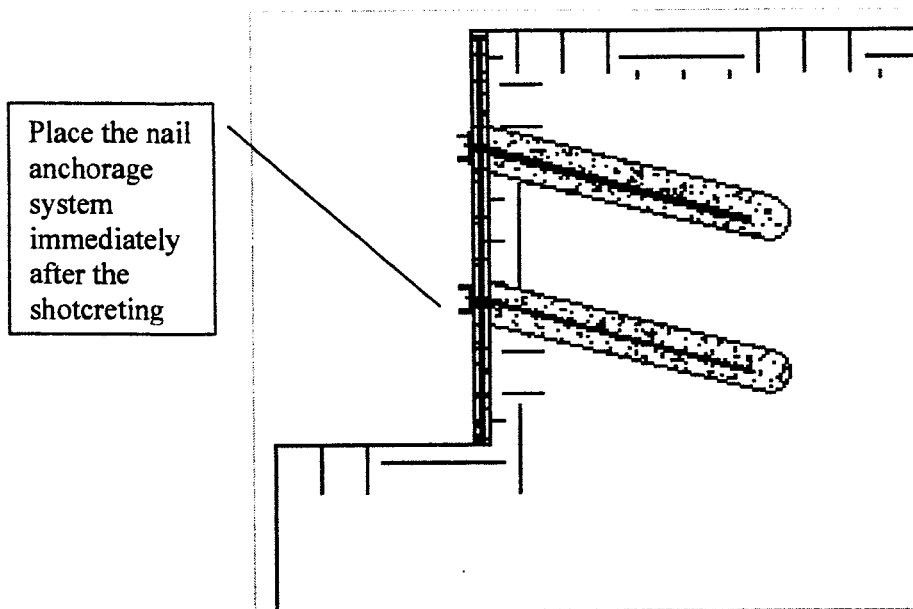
Picture showing step 8 of the construction process of Soil Nail wall
